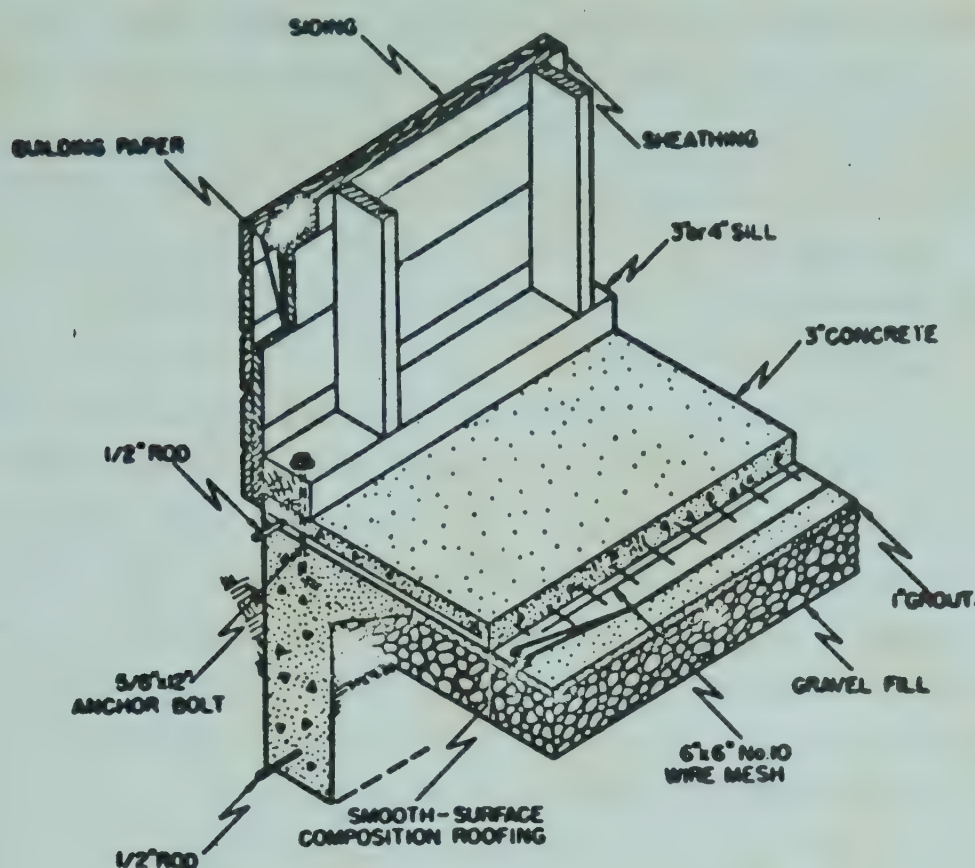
Foundation, floor, and wall construction for wood grain bins. Note composition roofing for moisture barrier in concrete floor and building paper under siding for weather tightness (Shedd and Cotton, 31).
